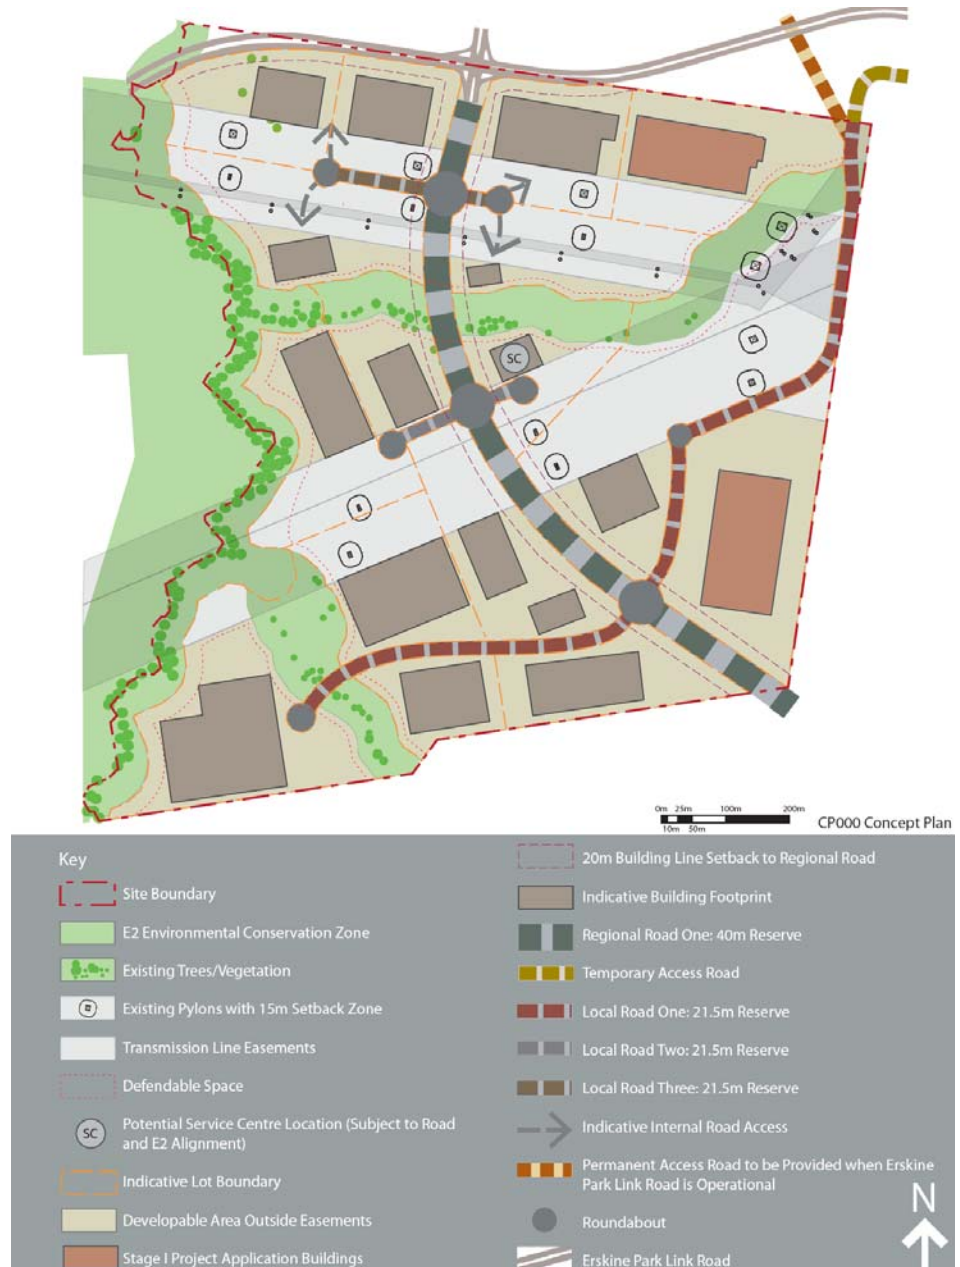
Proposed Ropes Creek Employment Precinct Concept Plan
